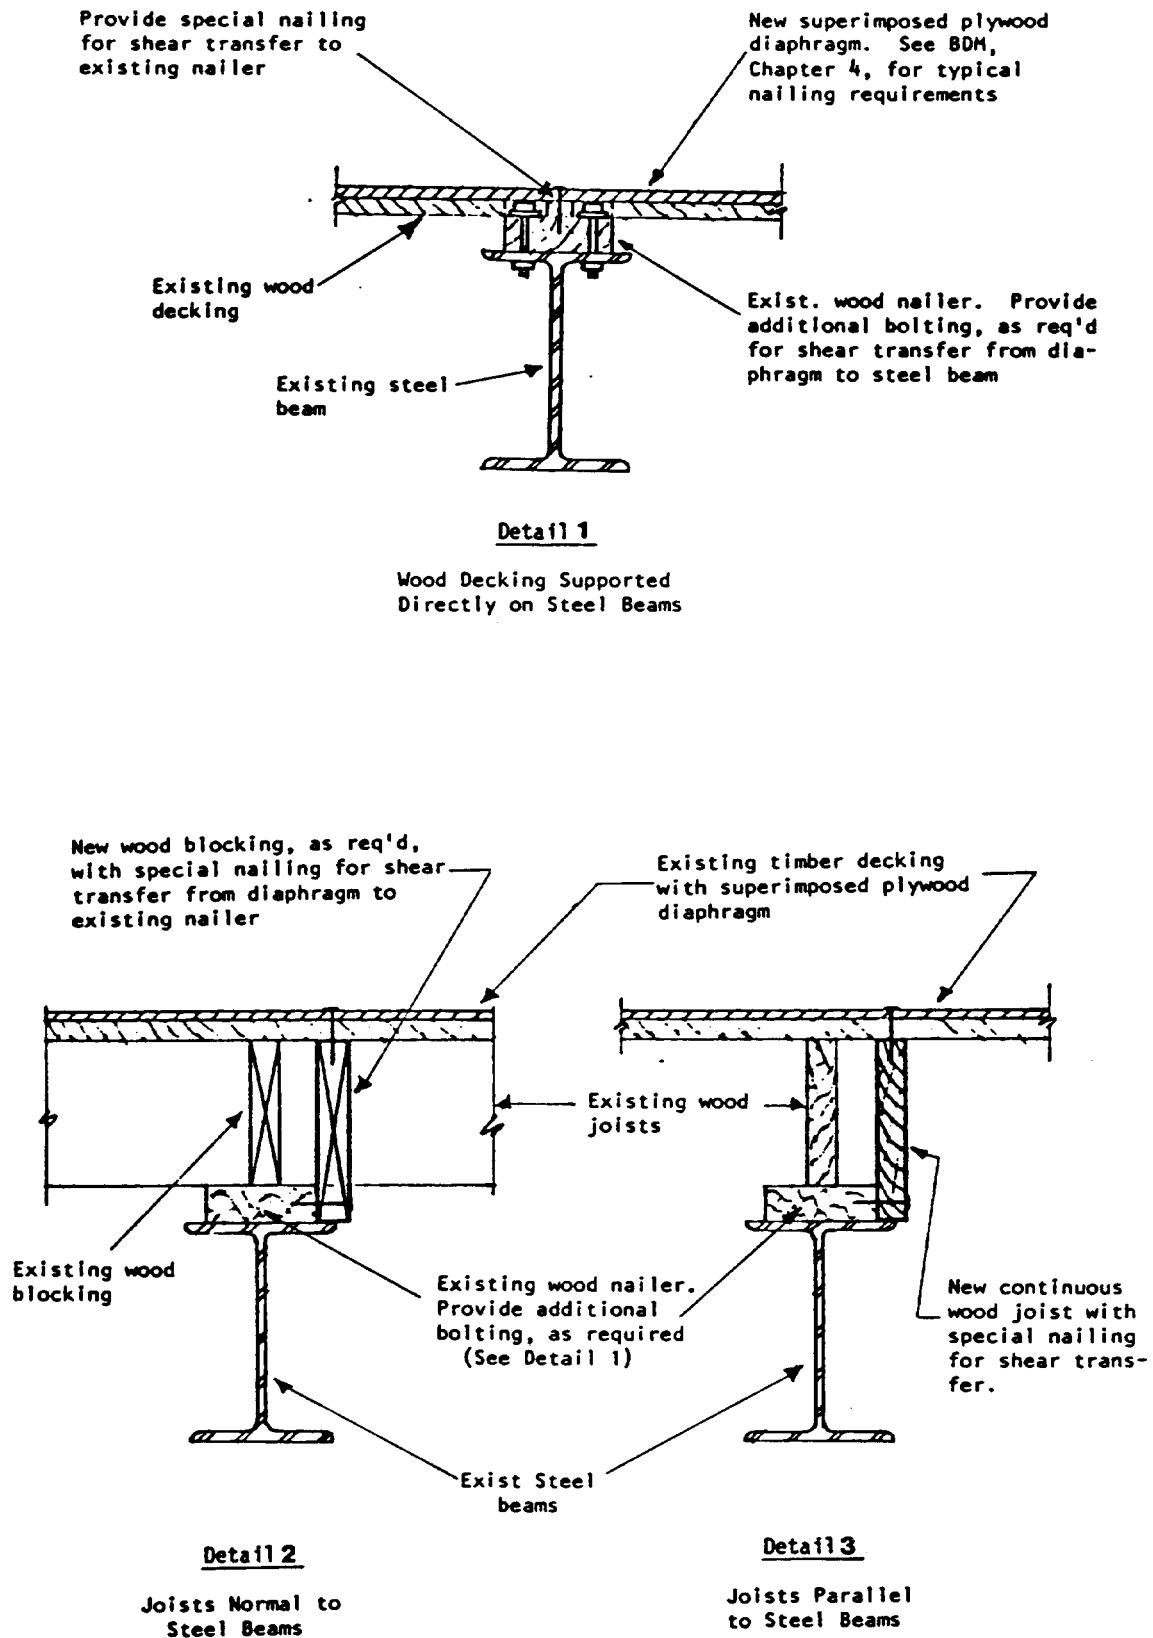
Strengthening of existing wood diaphragms in steel frame buildings
